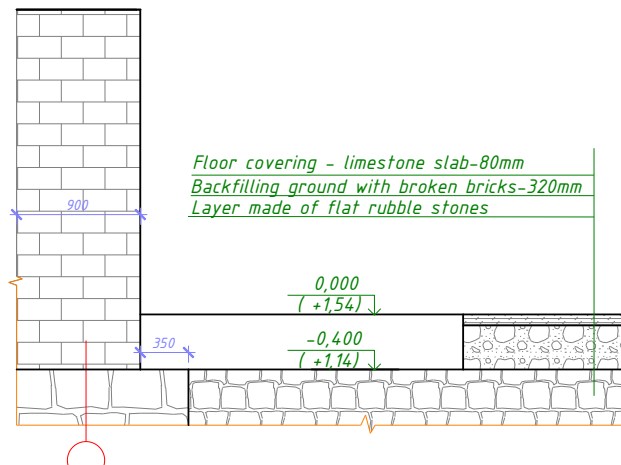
Elagin Palace. Saint-Petersburg. The foundation of the internal wall. Lining of 2 layers of limestone masonry as the floor basement
